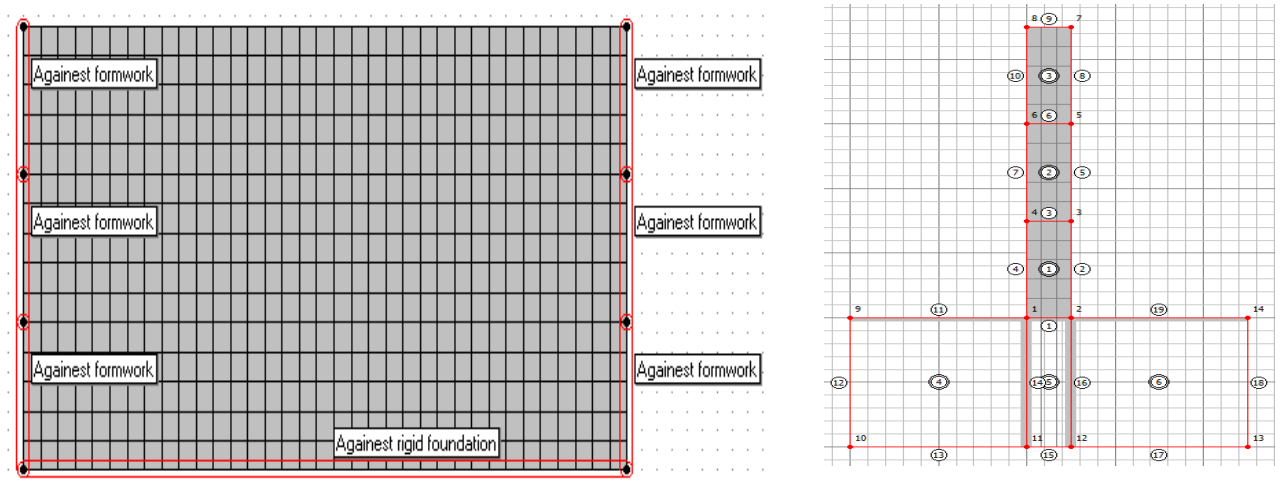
7 plane section and cross section of massive wall model in Hacon 3
